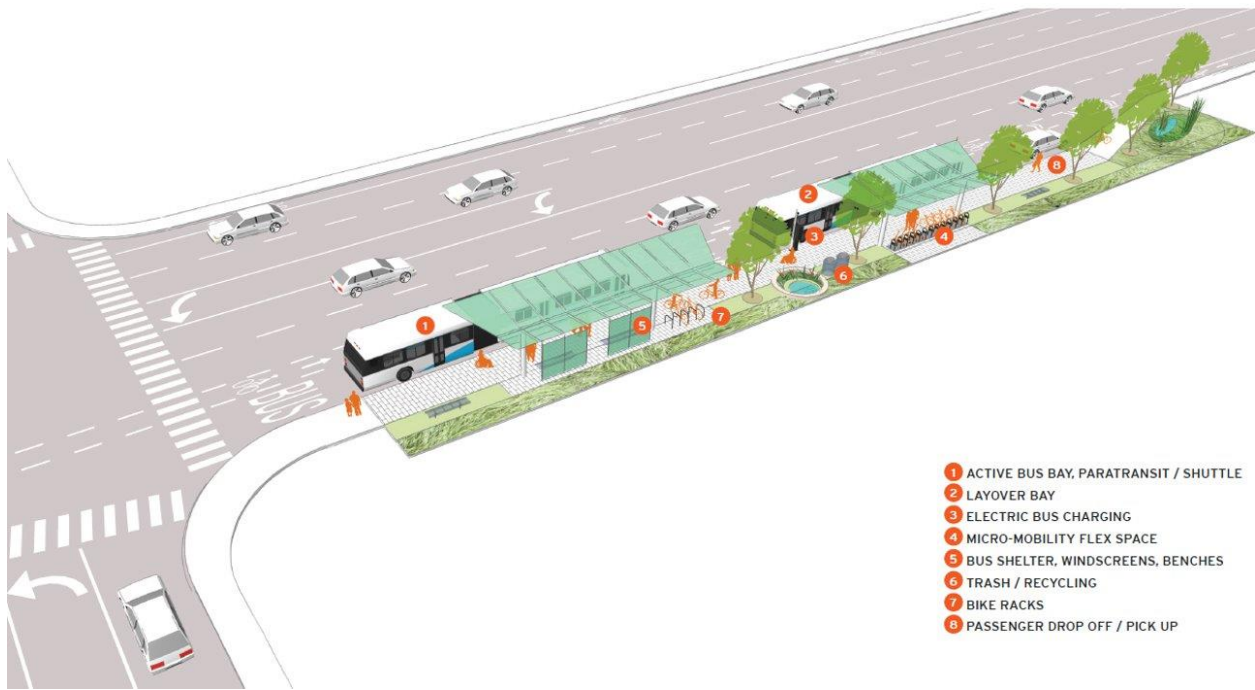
South Salem Super Stop Prototypical Design – View 2
